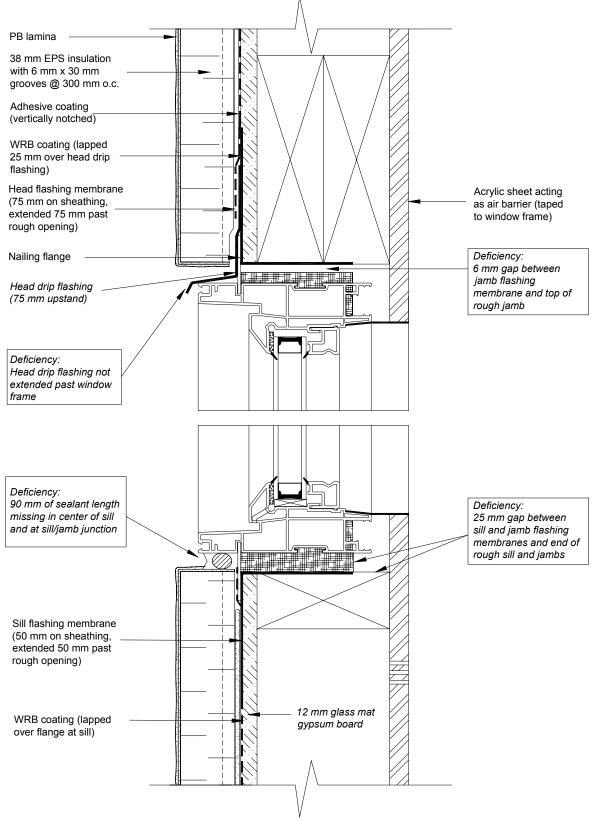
Wall/window interface for specimen No. 9 -vertical section
